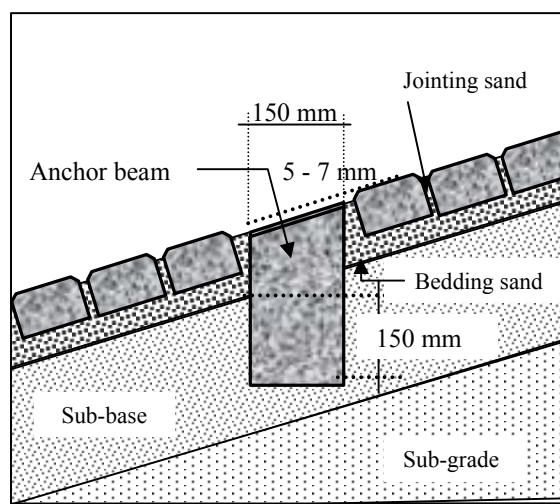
Spacing of anchor beams (*CMA, 2000*)
